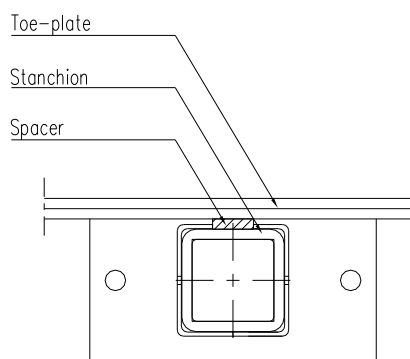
5mm spacer stanchion/toe-plate fixing for handrail system removal
